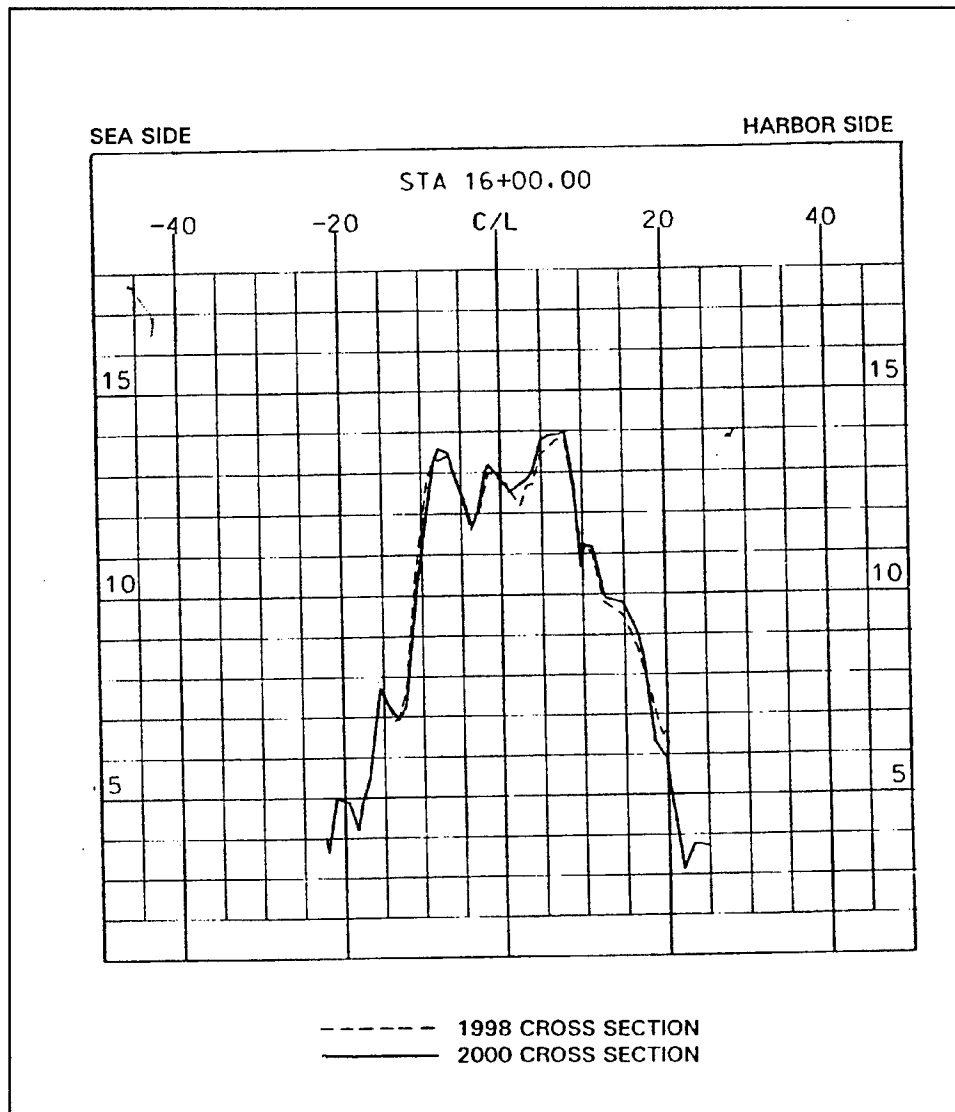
Cross sections of Morro Bay outer south breakwater, sta 16+00
